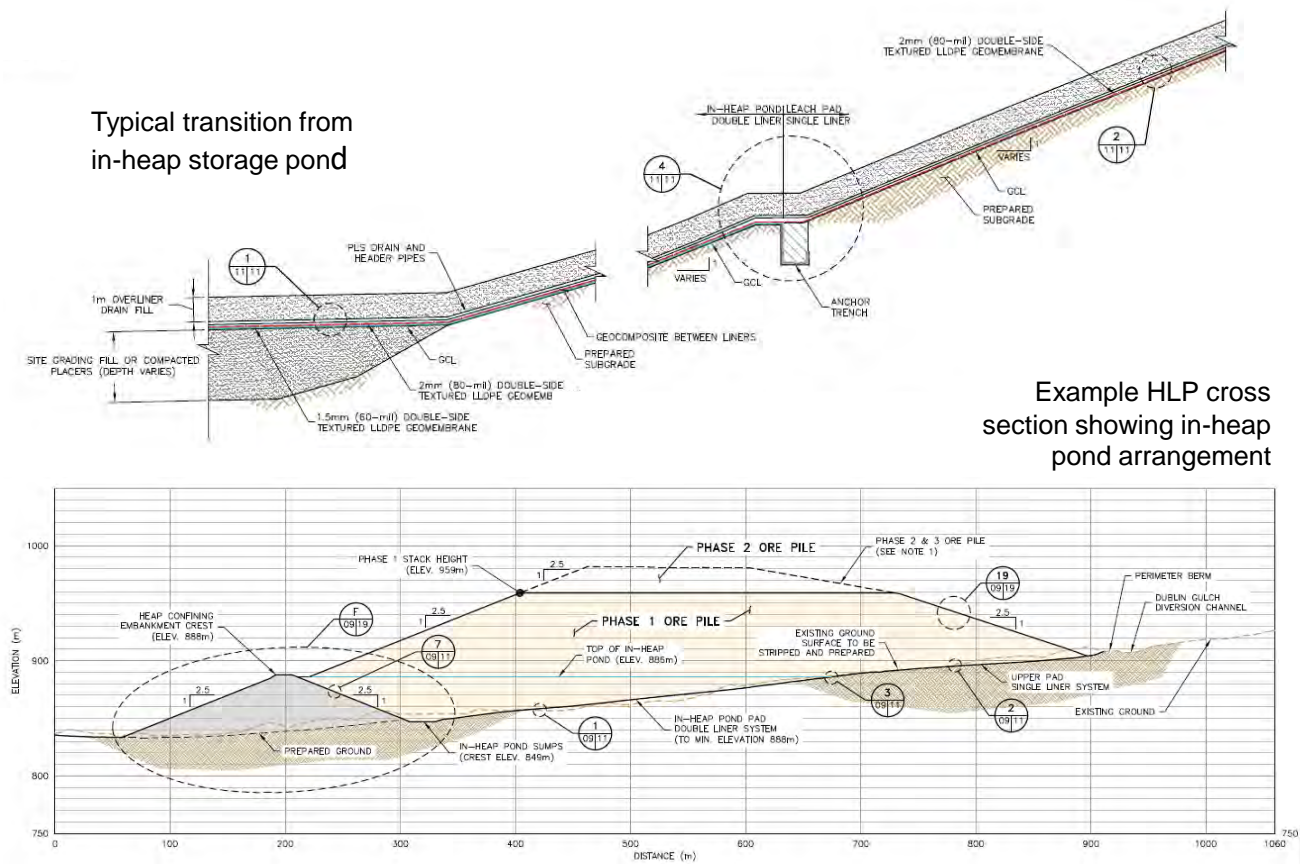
Example HLF Cross-Sections, Showing Typical Transition and In-Heap Pond Arrangement
